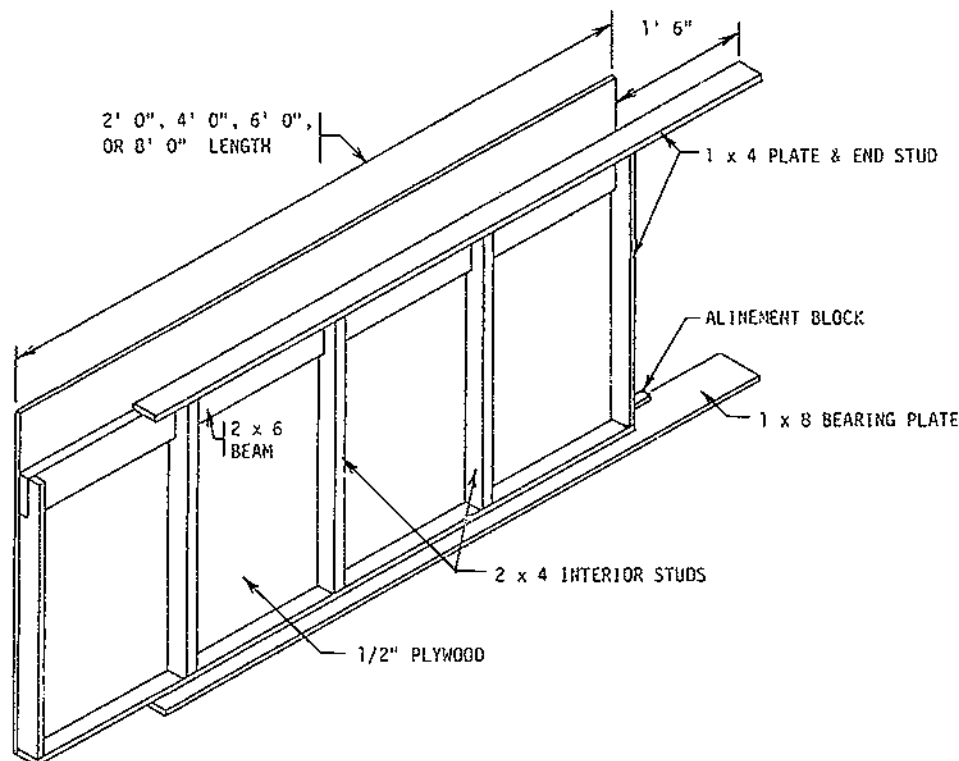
Redesigned foundation panel for load-bearing wall.
